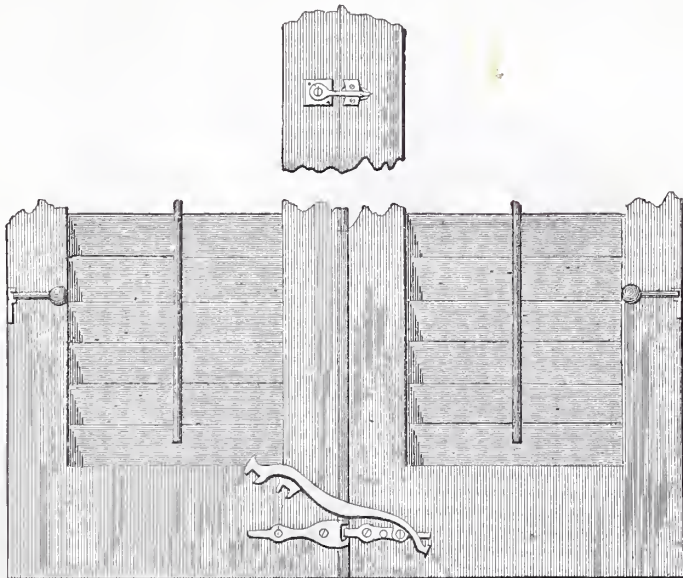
Interior View of Shutters Closed, Showing Fastenings.
